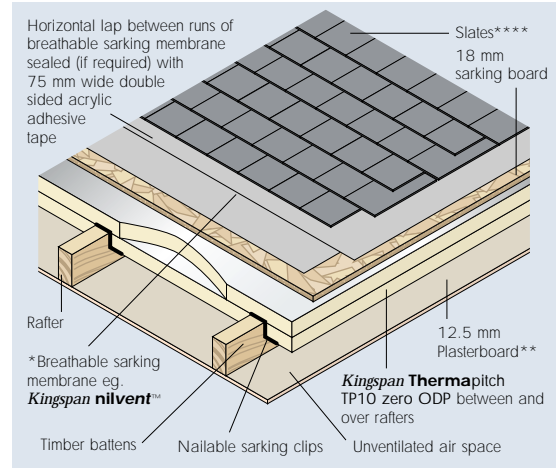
UNVENTILATED INSULATION OVER RAFTERS (Recommended for new build or re-roofing)
